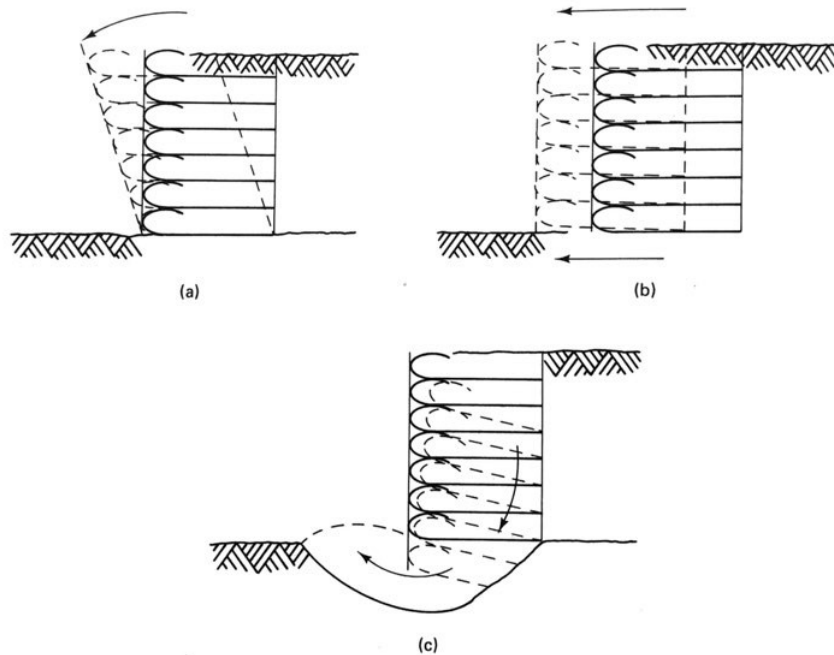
Failure mechanisms of a reinforced soil wall (Rimoldi 2016)
